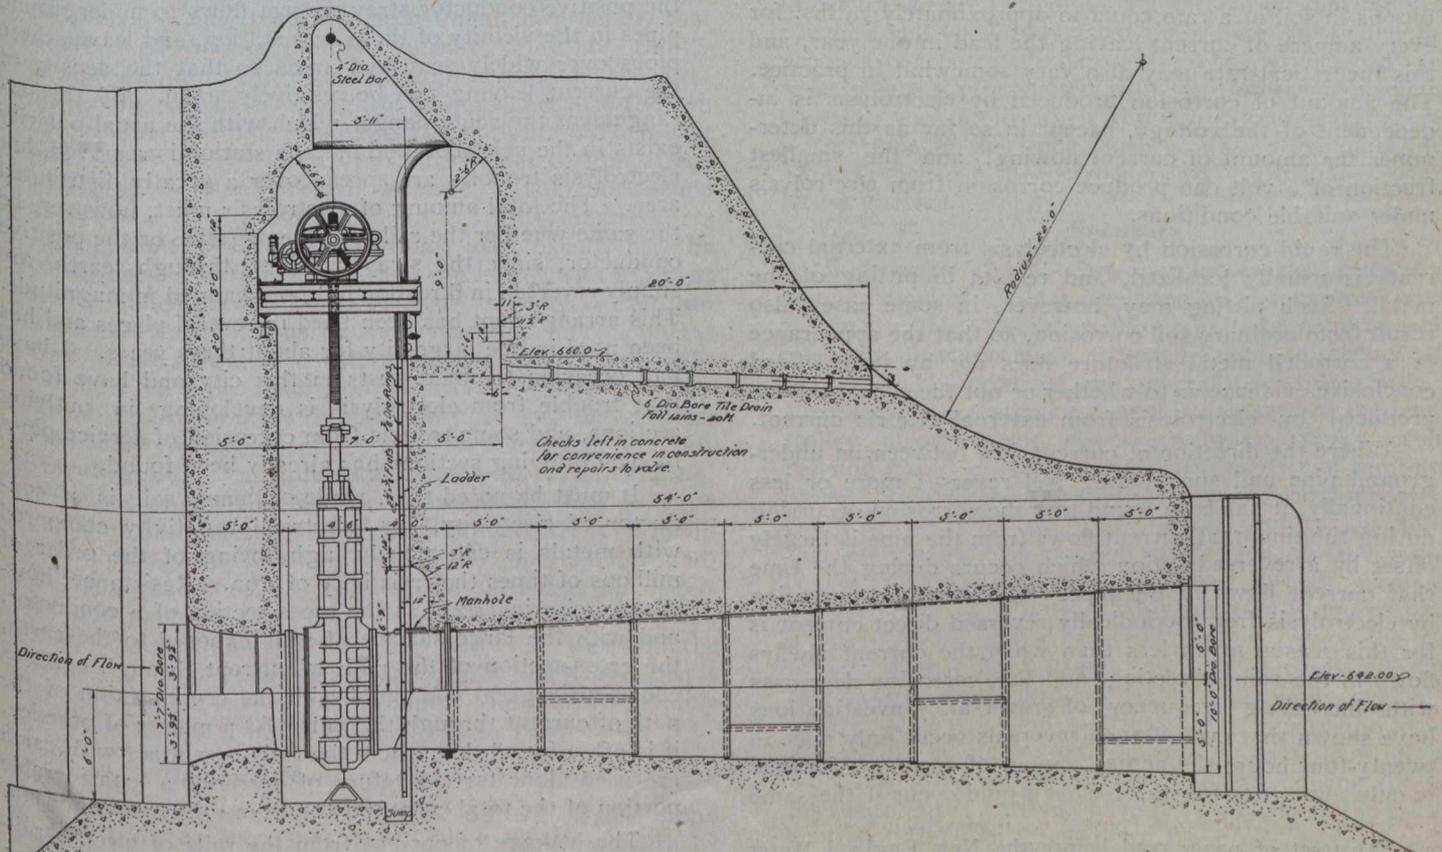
Side Elevation Showing Sluice Pipe and Sluice Valve and Arrangement of Operating Winch
